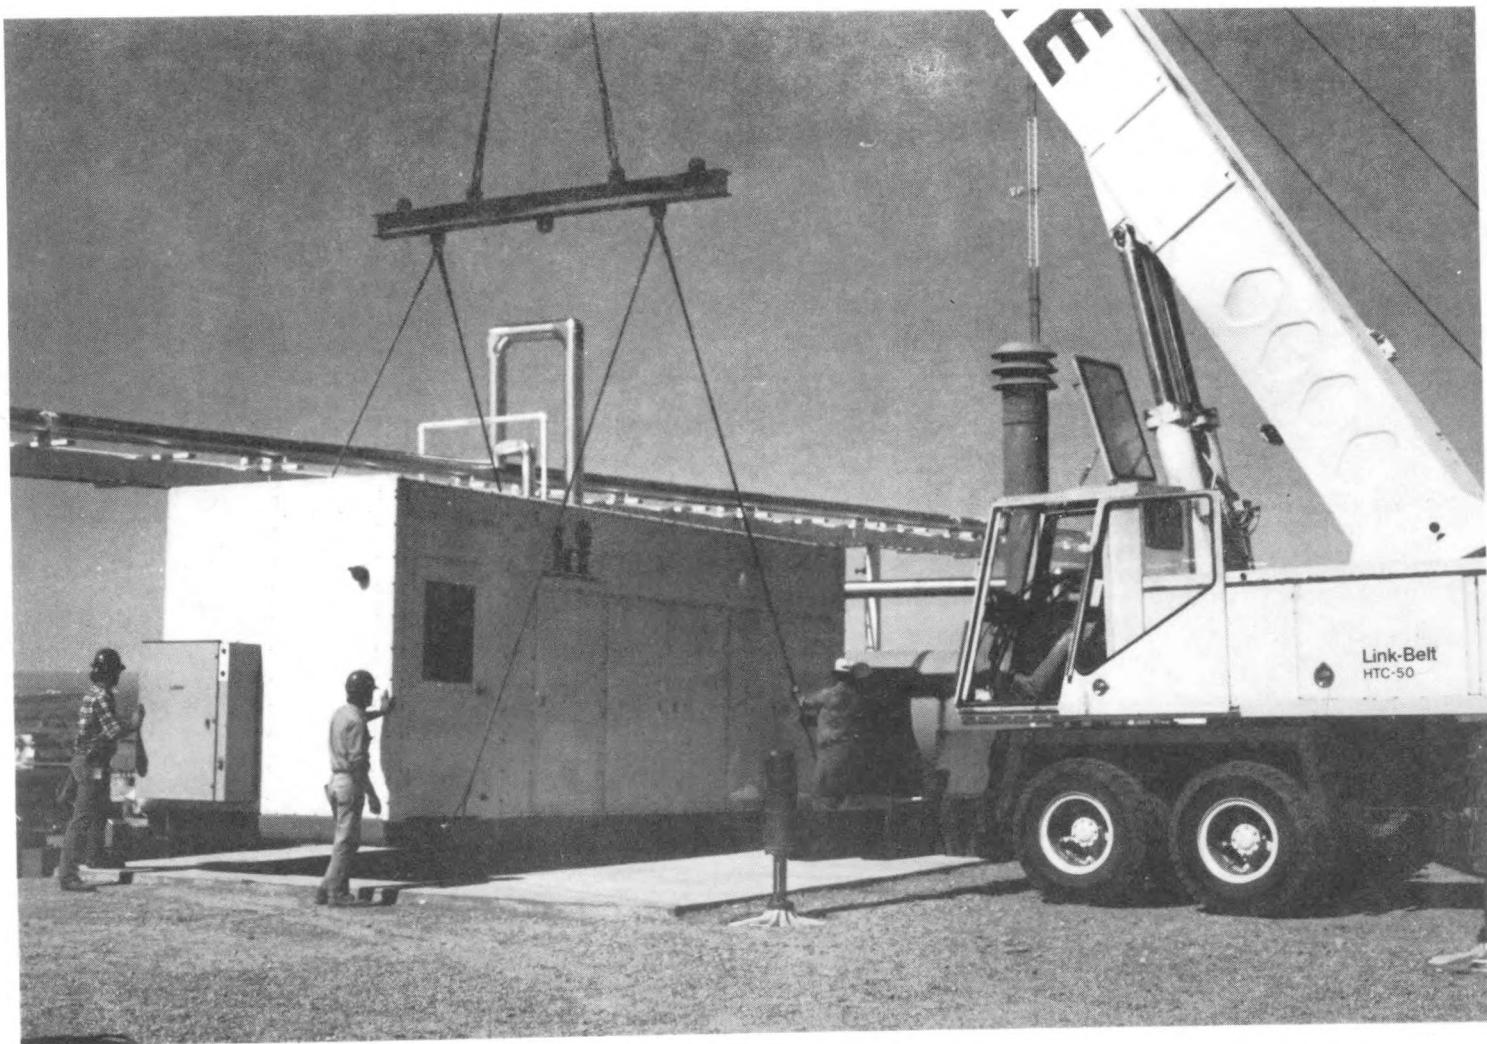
SKI MISR Equipment Skid Being Lowered into Place
